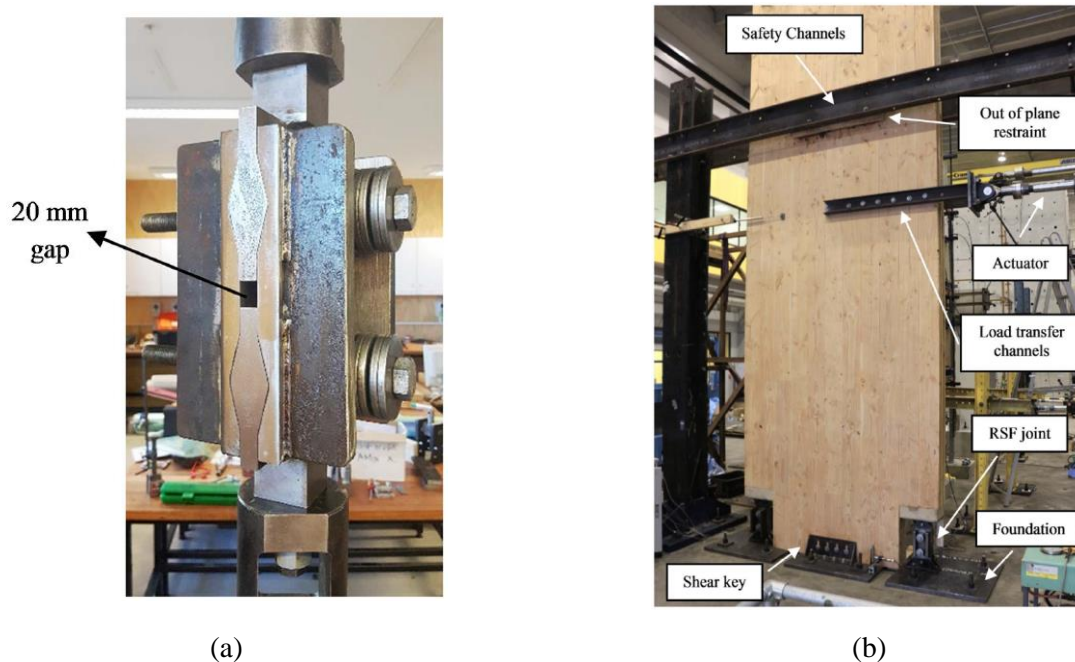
Experimental testing of rocking CLT walls with the RSFJ: (a) joint test, (b) wall test (Hashemi, Zarnani, et al. 2017a)
